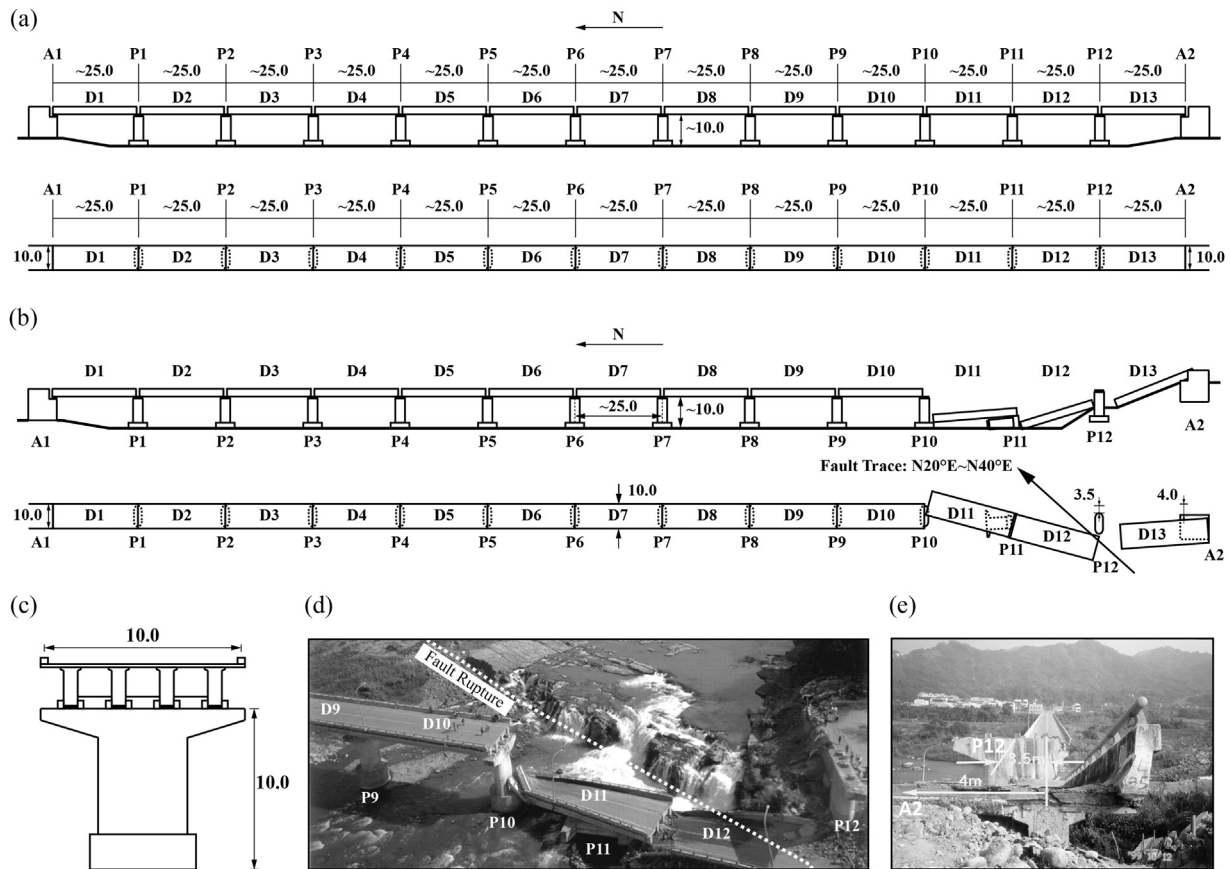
Pi-Feng Bridge during the 1999 Chi-Chi earthquake: (a) elevation and plan views of original bridge (unit: m); (b) elevation and plan views of collapsed bridge (unit: m); (c) typical section of bridge (unit: m); (d) collapsed bridge and created waterfall; (e) lateral movement of abutment A2 and pier P12 (Fig. 6b is generated based on information provided by Kawashima [61,62]; Fig. 6d is modified from Anastasopoulos et al. [5]; Fig. 6e is modified from Kawashima [61,62]).
